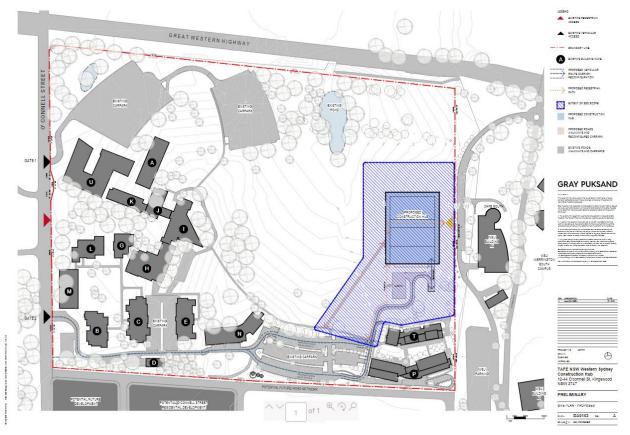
Proposed site plan showing location of works to the eastern portion of the site
